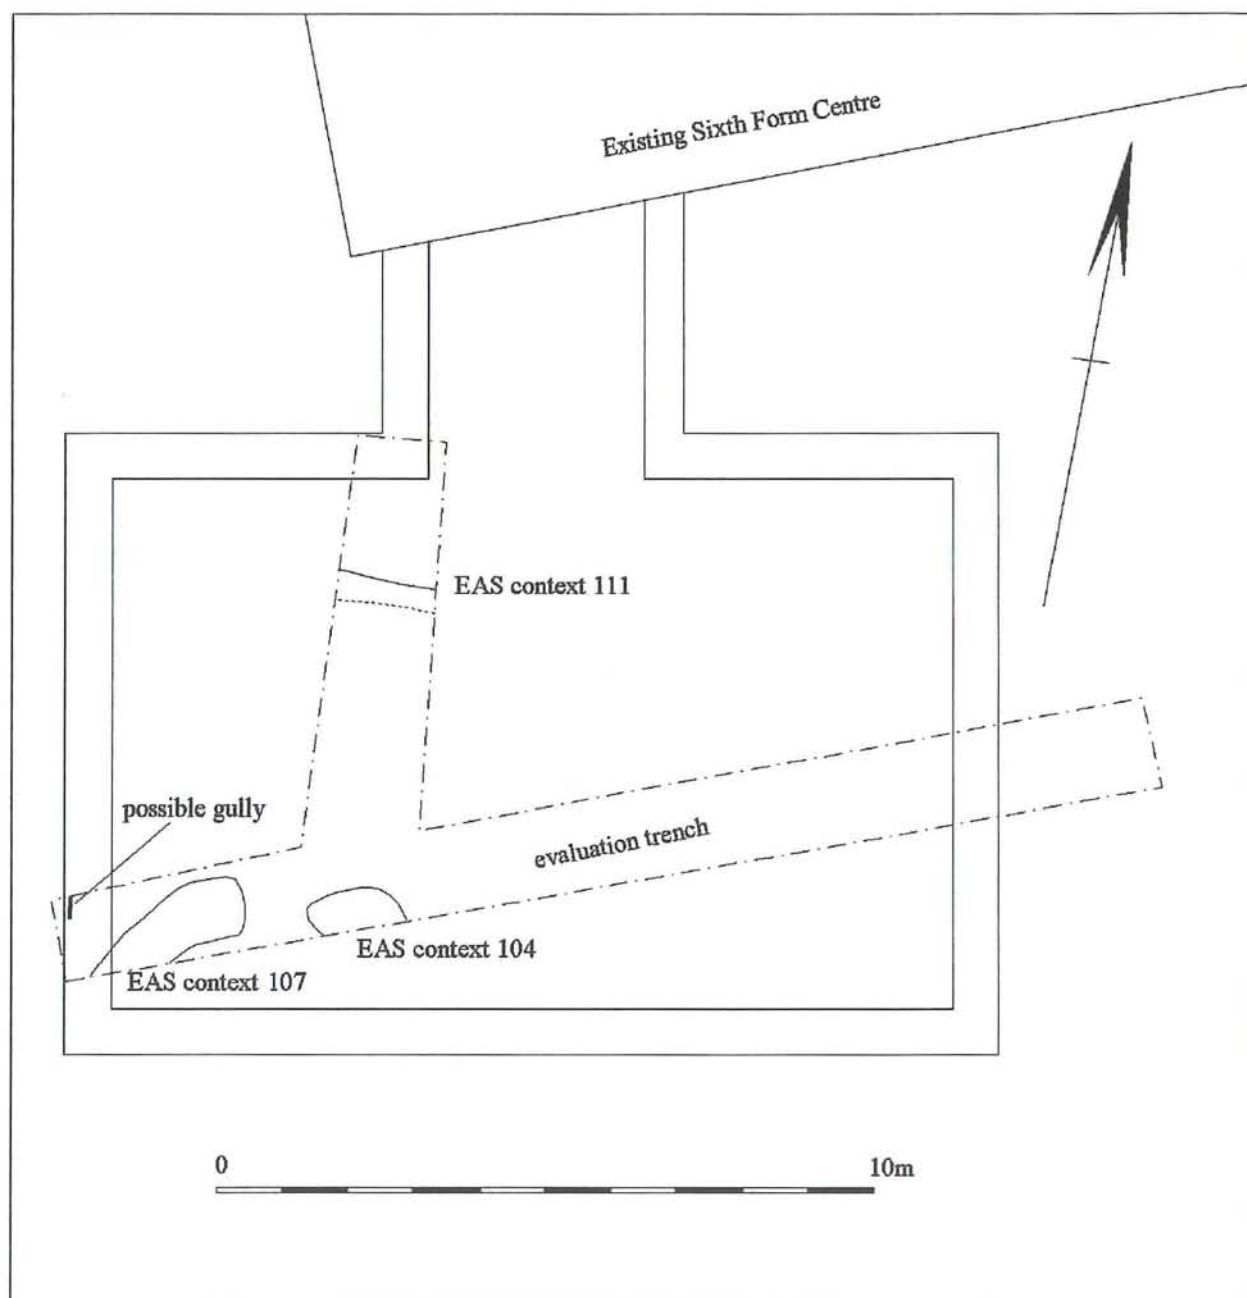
Plan of foundation trenches showing EAS evaluation and location of a possible gully noted in section
